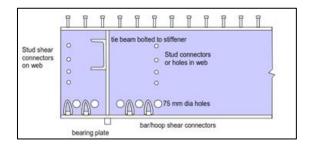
Using shear studs to transferring bending moment from steel girder to end abutment. ^[7]
